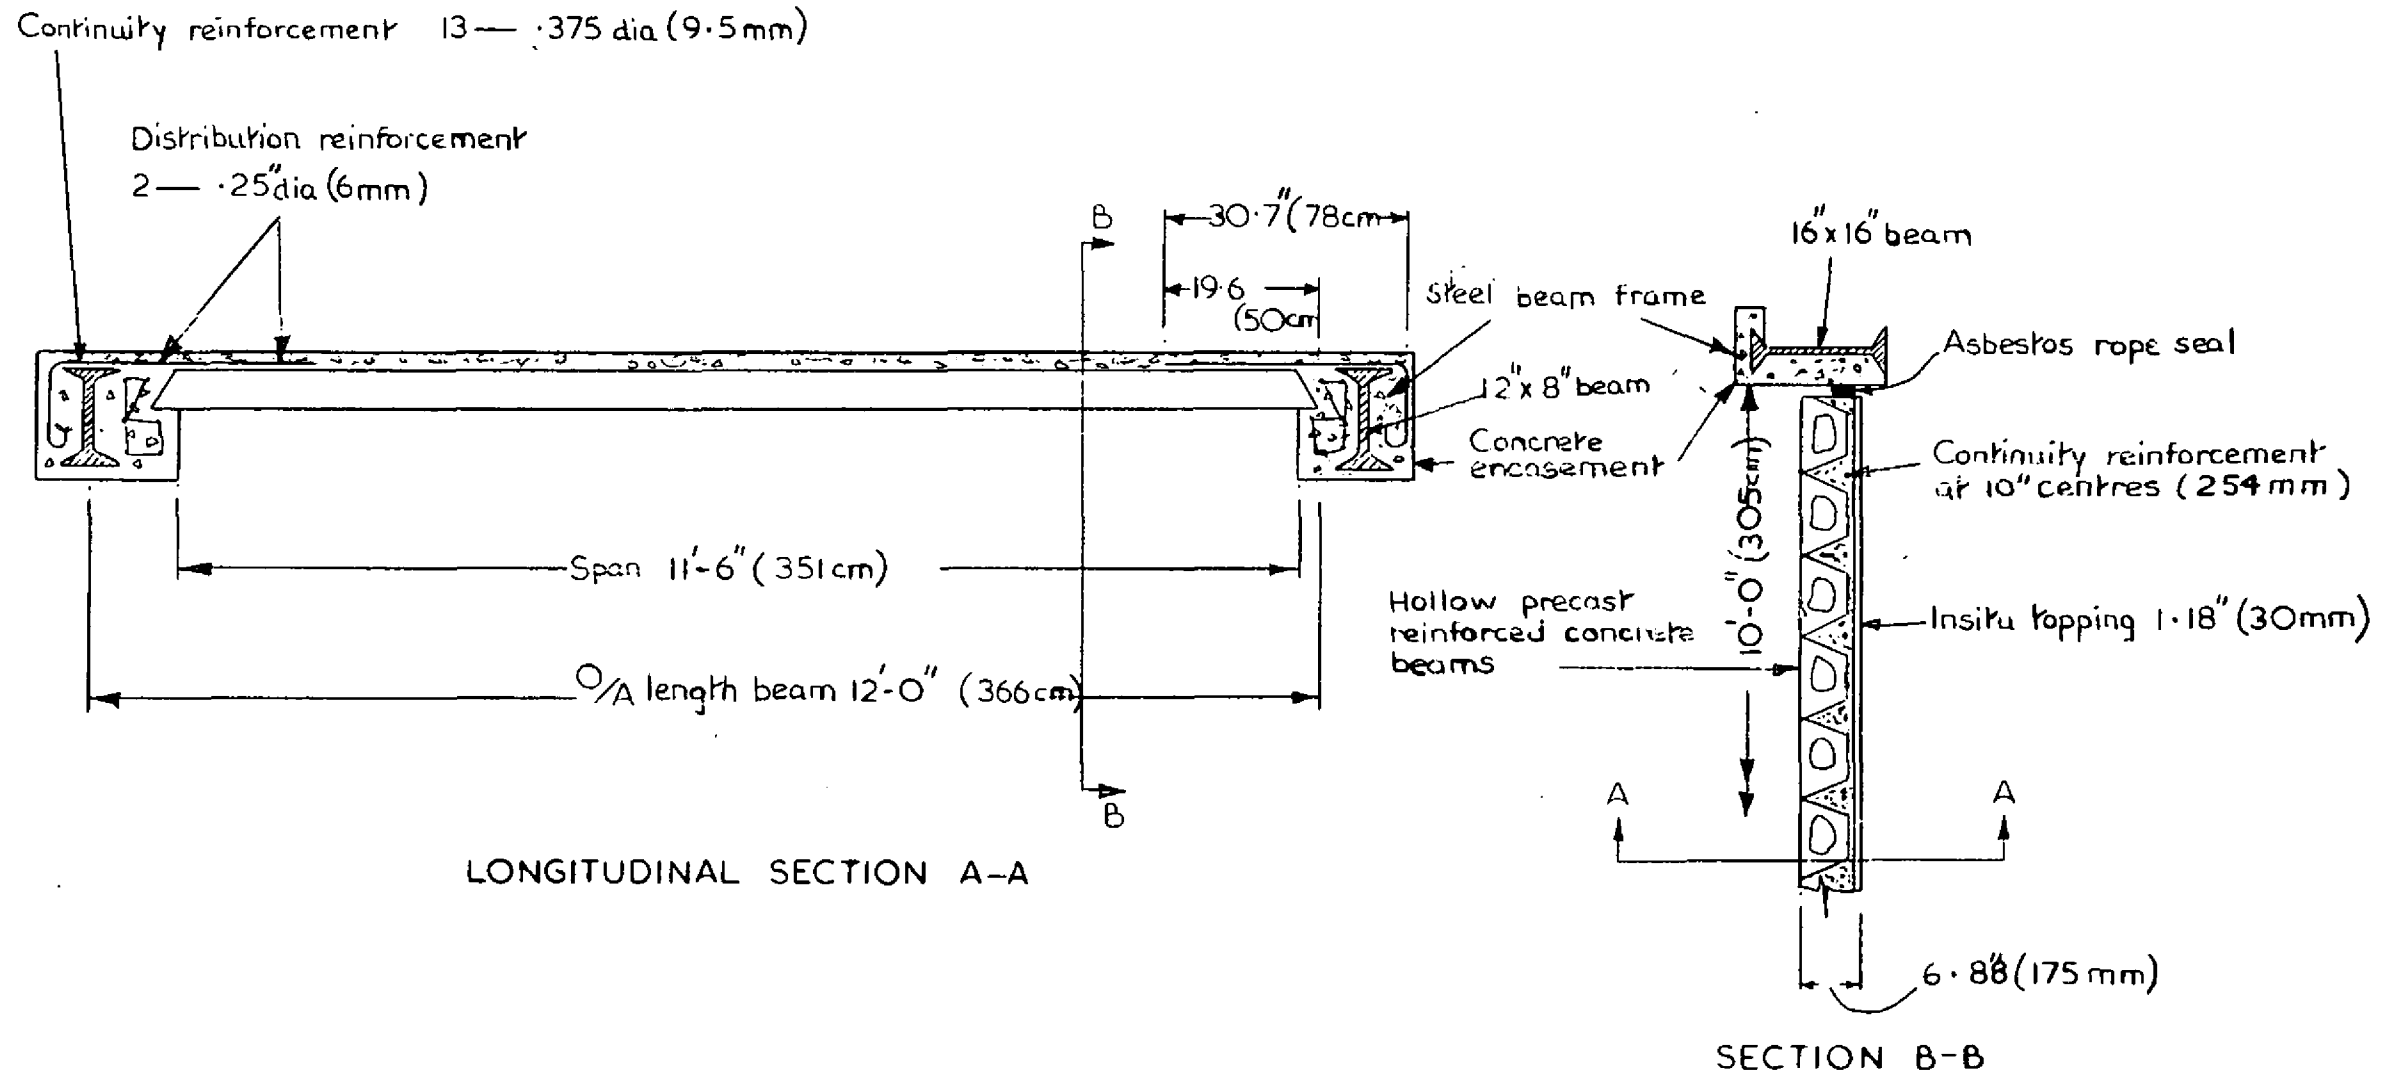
SPECIMEN No. 3. CONCRETE FLOOR WITH LONGITUDINAL AND ANGULAR RESTRAINT
